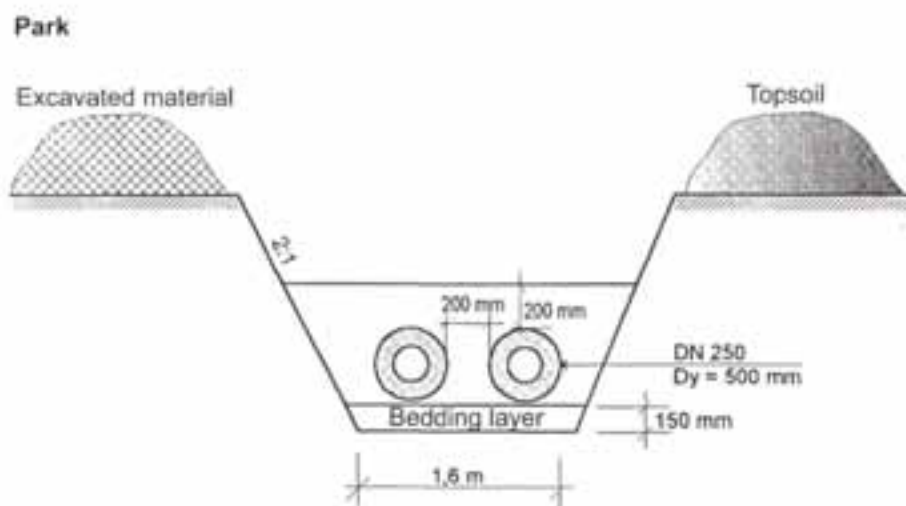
Example of pipe trench section in a park, dimension DN 250
